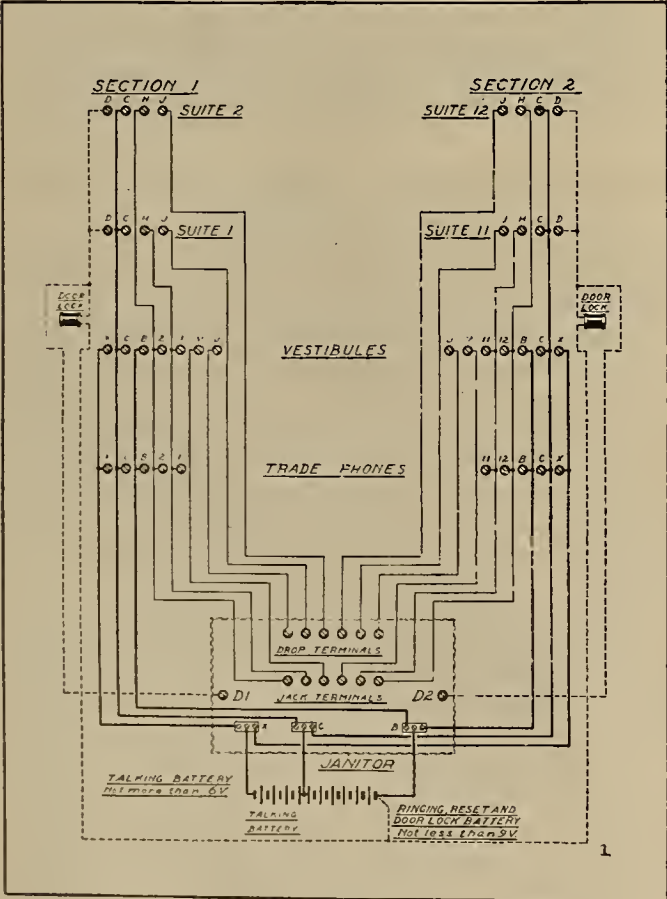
Wiring plan for S. H. Couch Company, Inc., non-interfering apartment house system.
